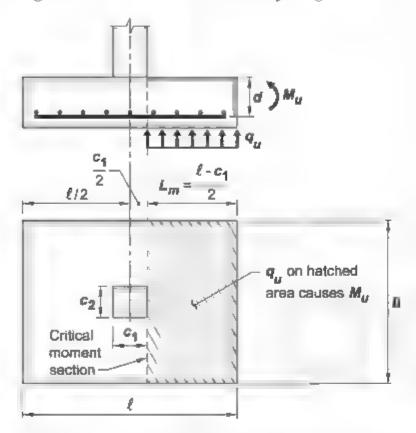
3d—Moment critical section in footing at reinforced concrete column face
